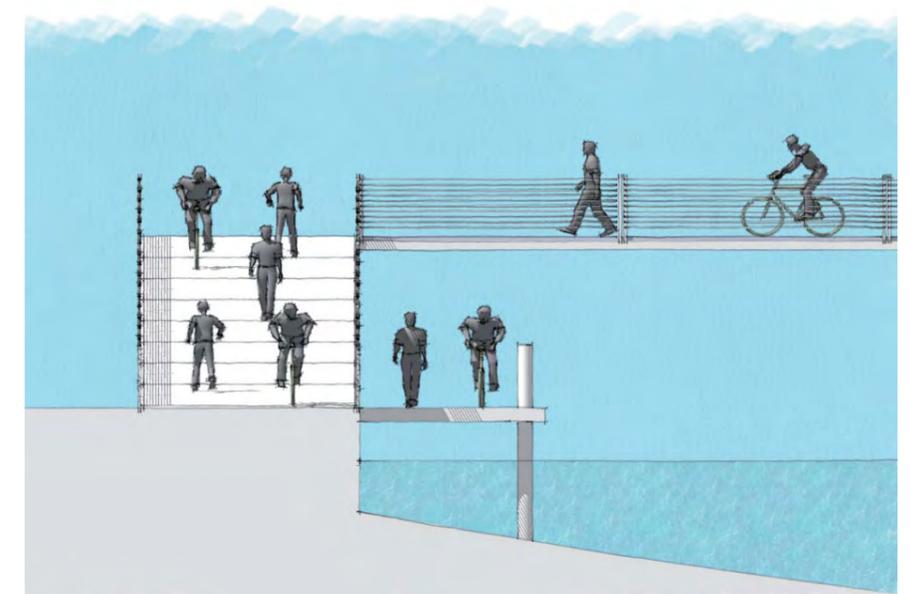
Approach ramps and stairs may be located upon the existing river bank with the footpath diverted onto a boardwalk next to the bank.
